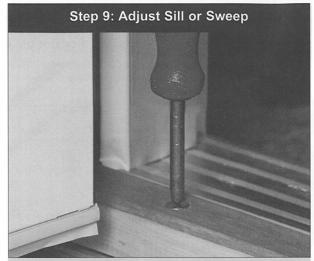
Raise or lower the sill by adjusting the three sill screws.
